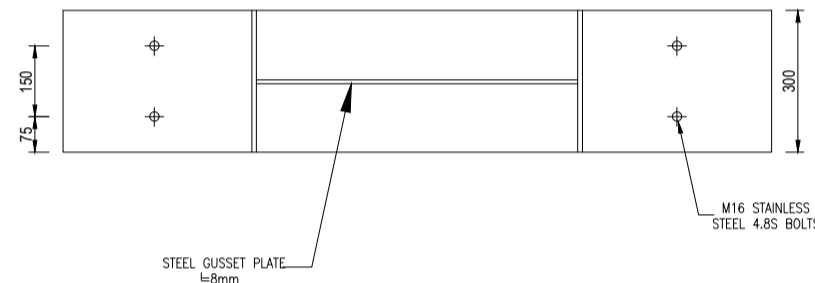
PIPE SUPPORT CONCRETE - DN650/500/300 PIPE
